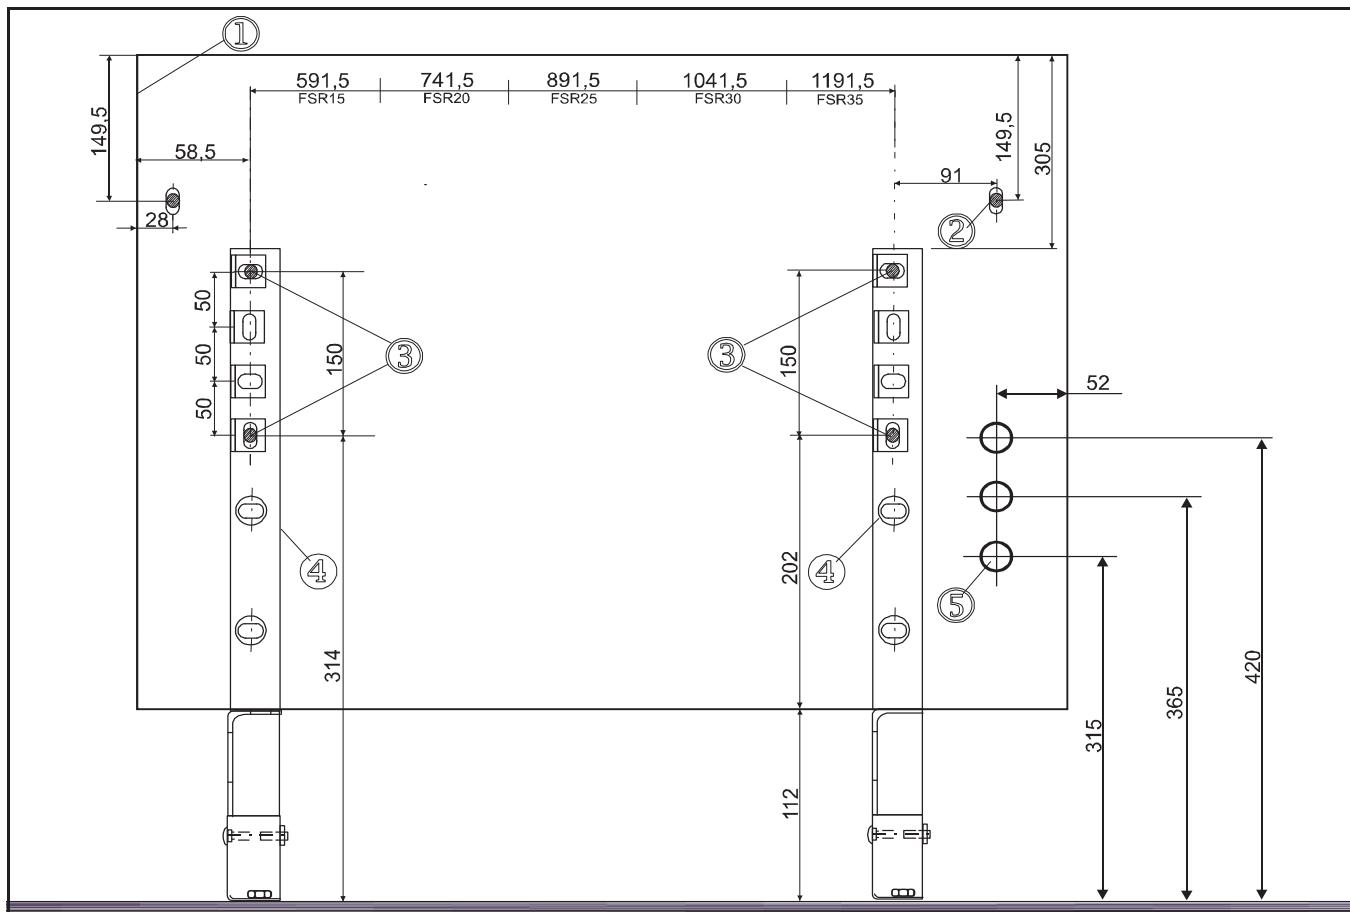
Drilling template for wall / floor installation with bracket accessory set WKO 18 (device seen from front)
